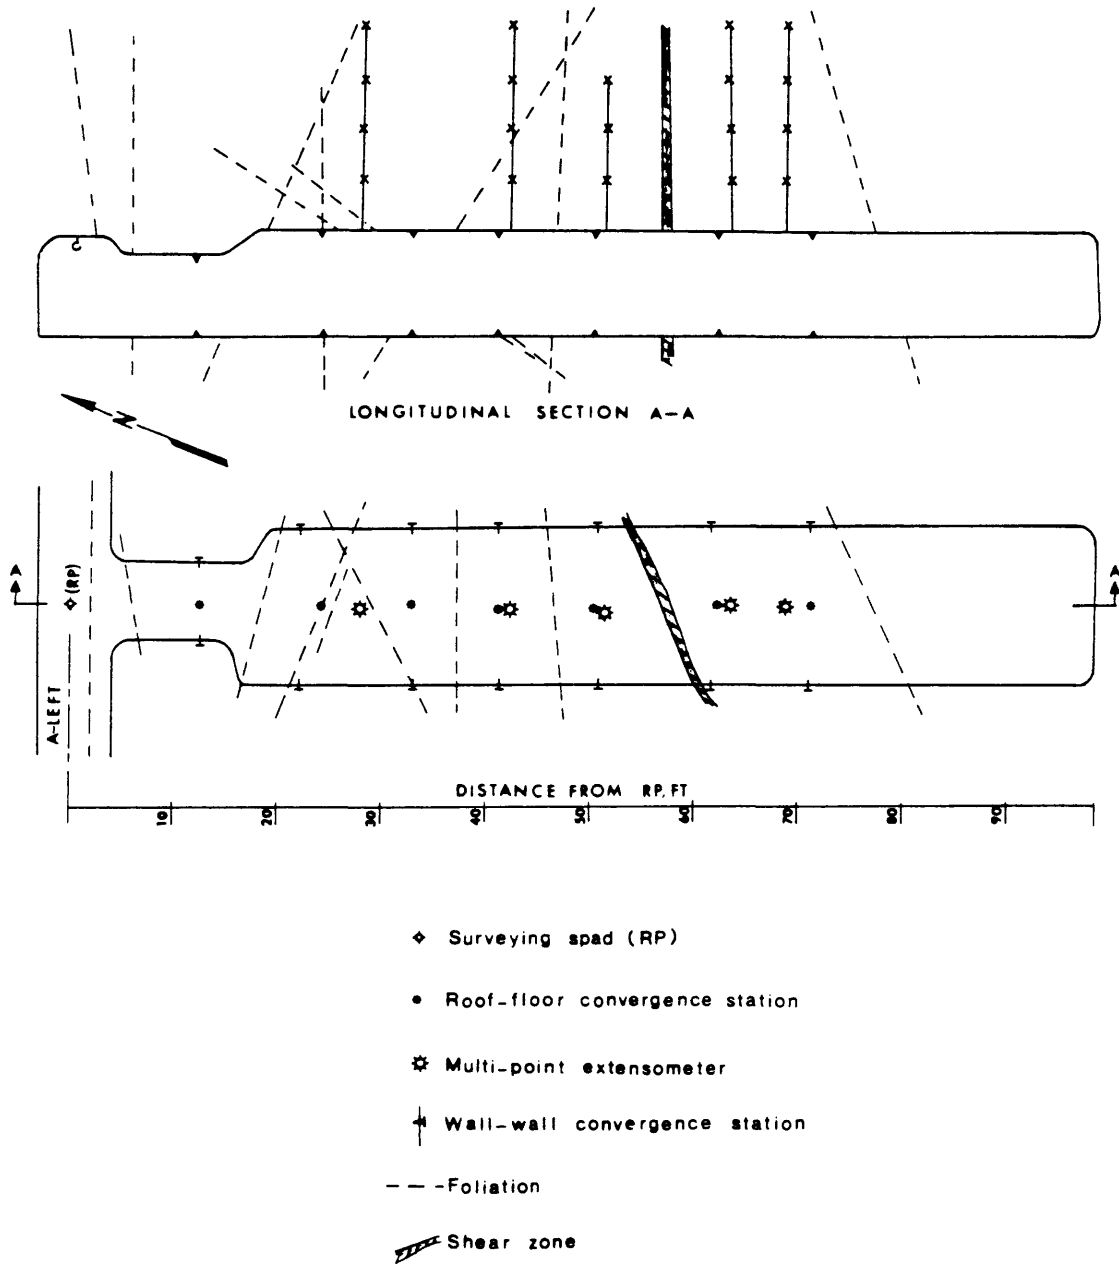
Plan view and longitudinal section of the instrumented room.
